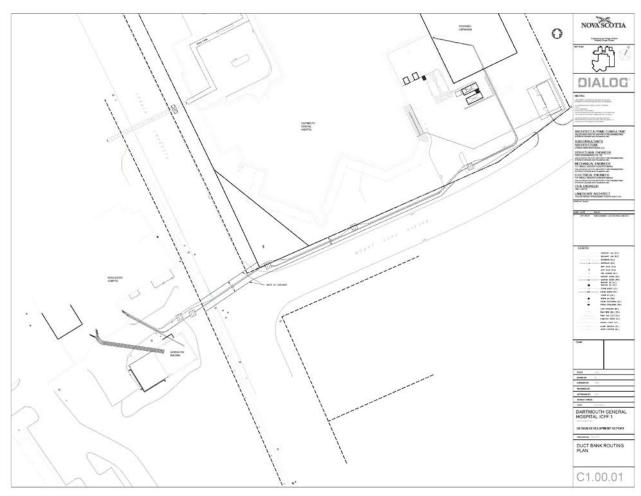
Full Engineered plan showing the plan view location of the proposed encroachment
